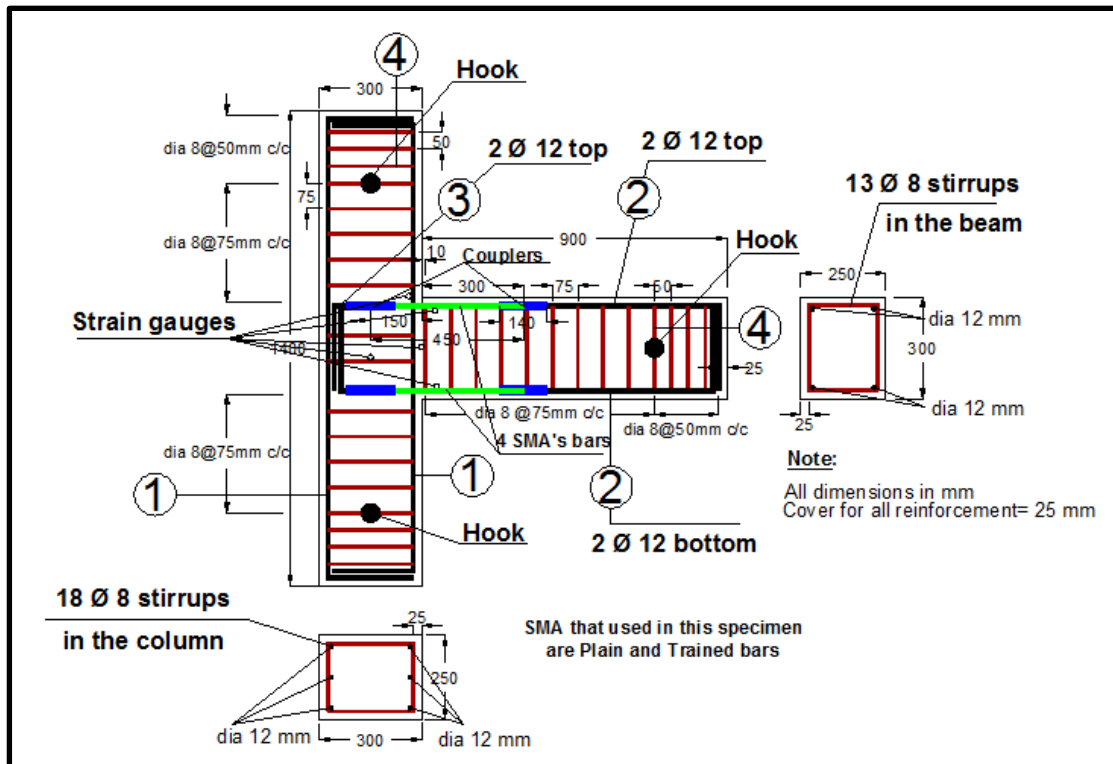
6: Geometry and reinforcement details of NiTi-BCJ-3 specimen
